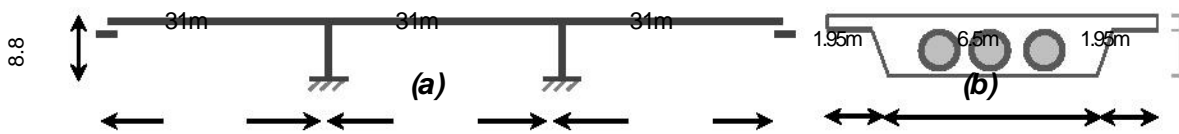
(a) geometry of the bridge and (b) section of the deck
